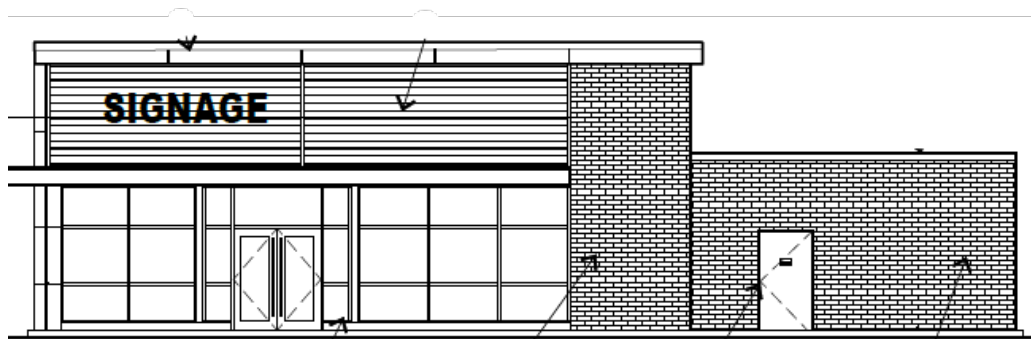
Elevation of the drive-thru restaurant buildings on Lots 1, 2, and 4.
